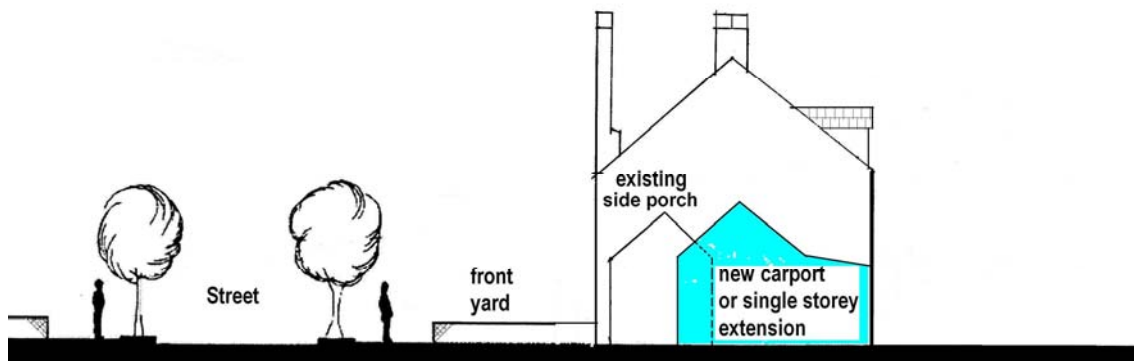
Side view – a new addition used as a carport, garage or dwelling space must be set behind an existing side porch. Roofs must be parallel with the slope of the existing roof or porch and use the same roofing material.
